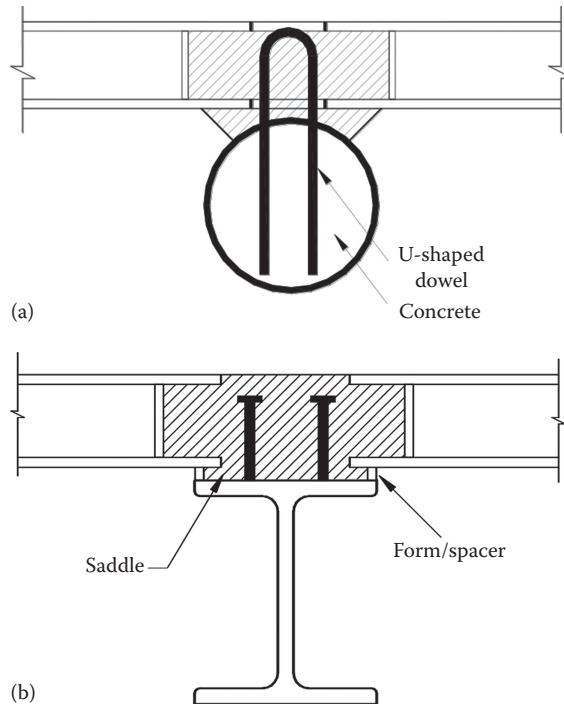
Connection designs for FRP decks to girders. (a) Concrete filled FRP girders and (b) steel girders. (From Zhao, L., Characterization of deck-to-girder connections in FRP composite superstructures, PhD dissertation, University of California, San Diego, CA, 1999.)
